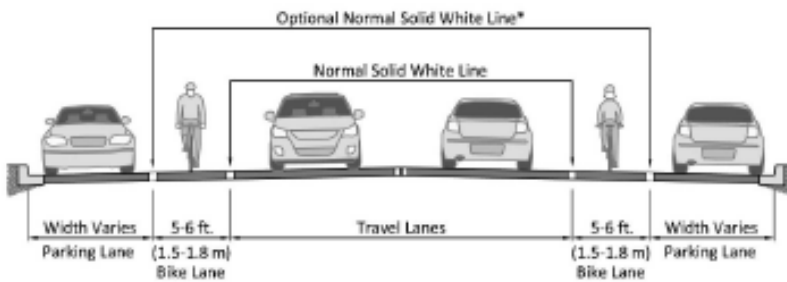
Typical cross-section of a bike lane facility with on-street parking. (Source: AASHTO)
